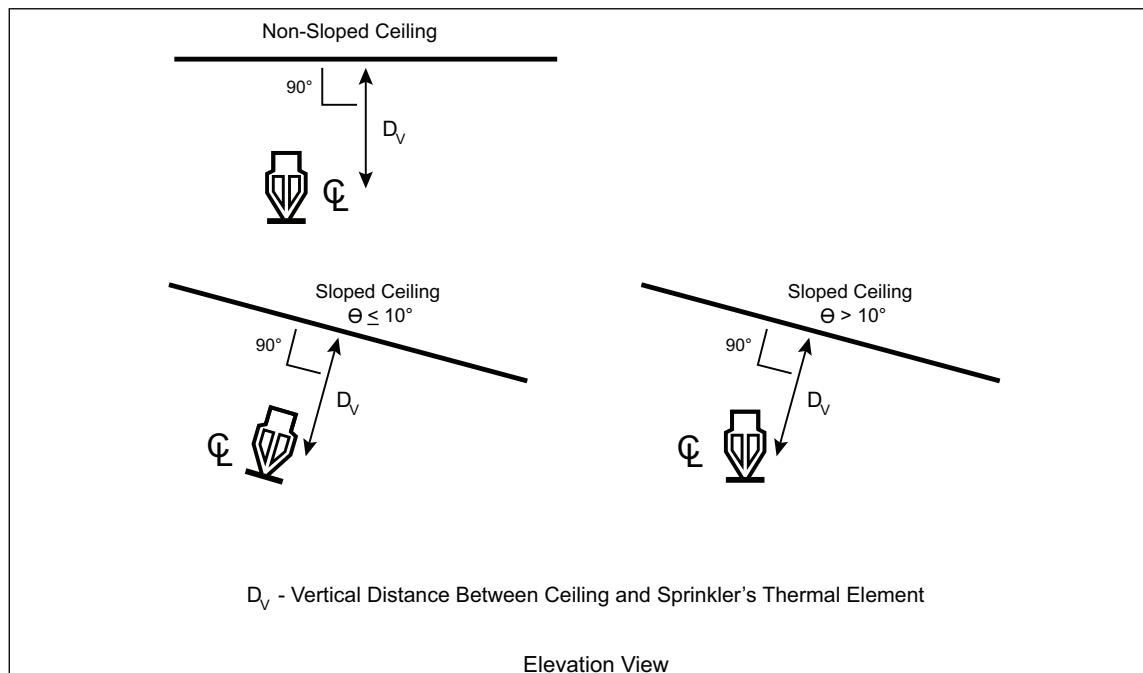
Measuring vertical distance between Storage sprinkler's thermal element and underside of ceiling
